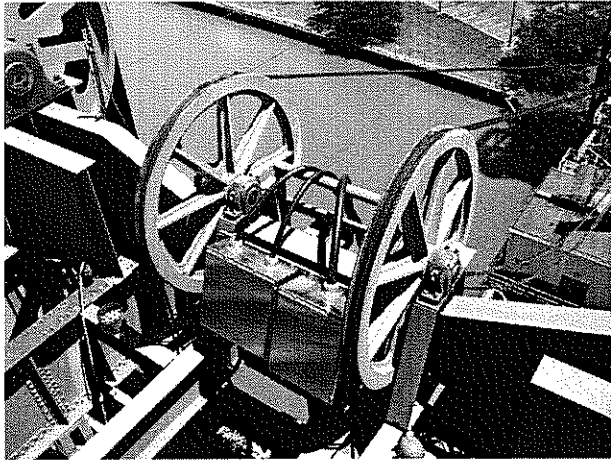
Auxiliary counterweight sheaves and messenger cables at West 3<sup>rd</sup> Street in Cleveland, Ohio
